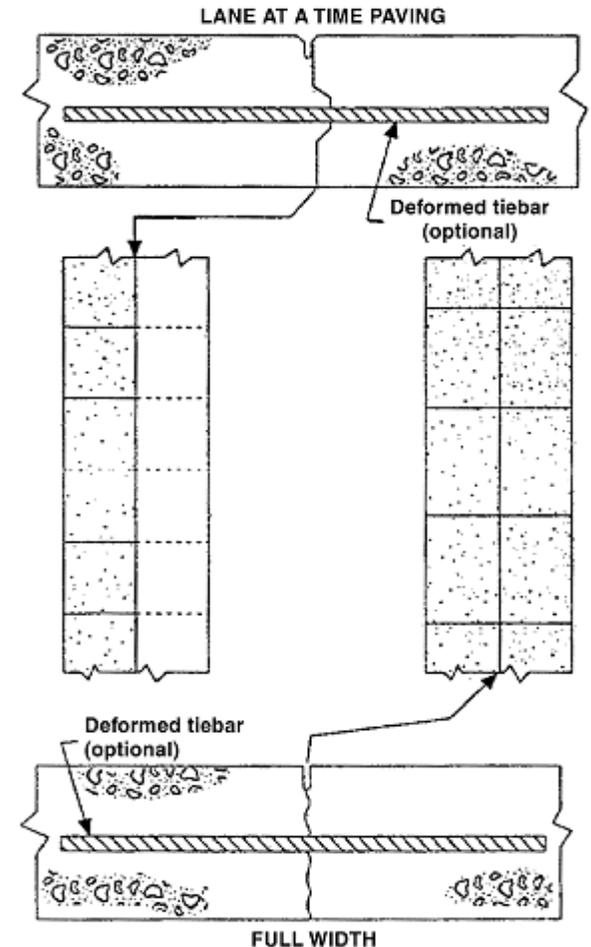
Longitudinal joints.³³ (Note: use butt joint with tie bar for pavements 150 mm [6 in.] thick or less.)
